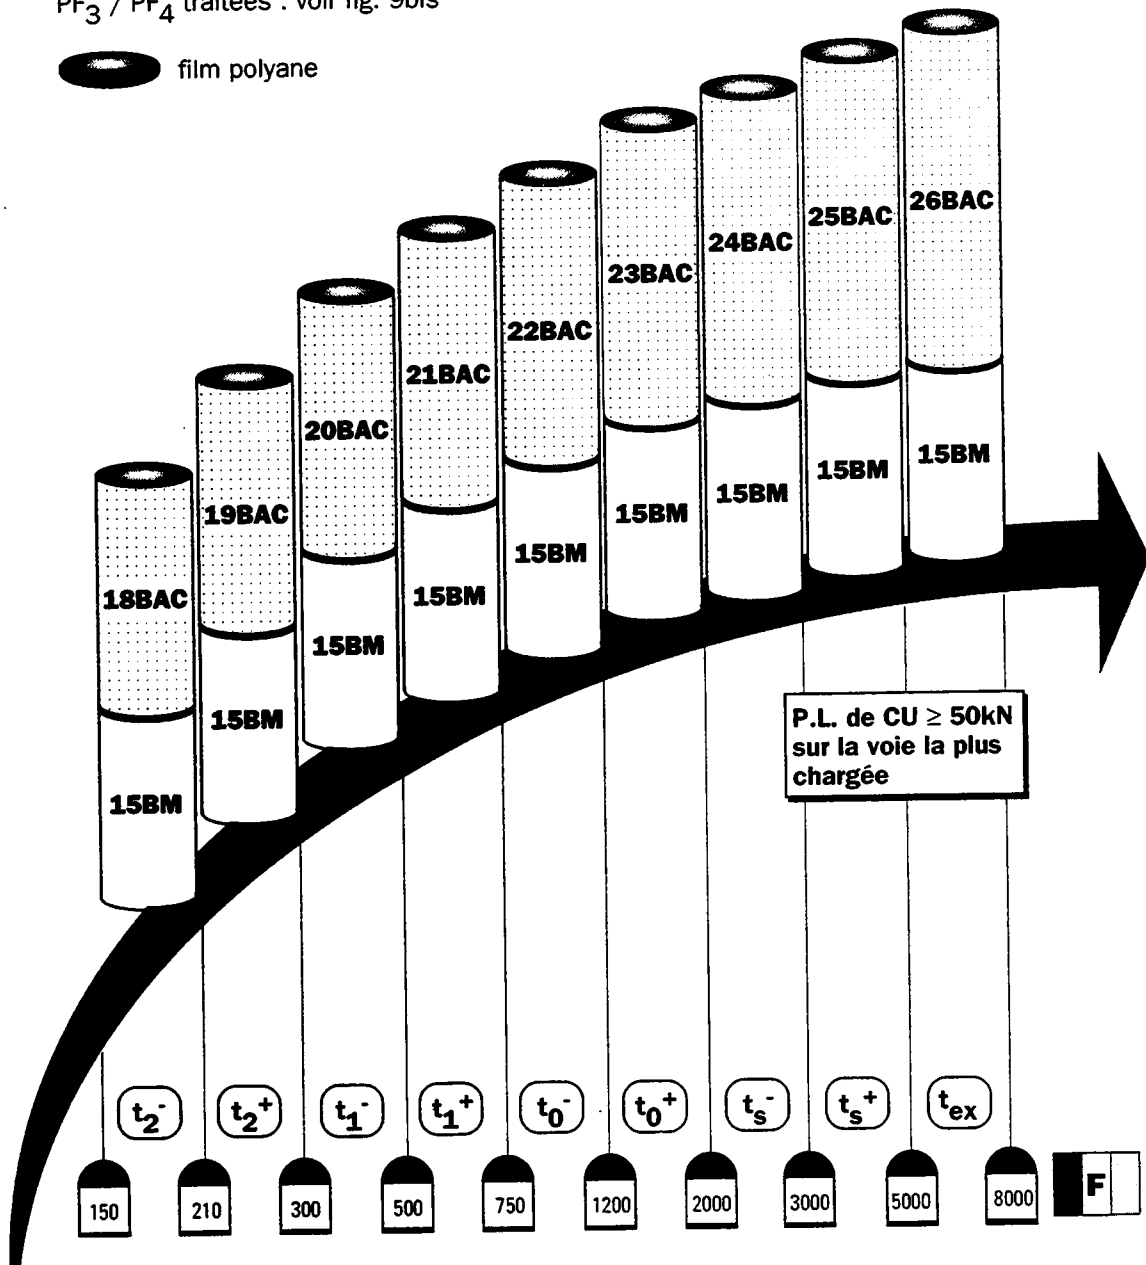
Example of a Design Catalogue for a Continuously-Reinforced Pavement. ³⁹
